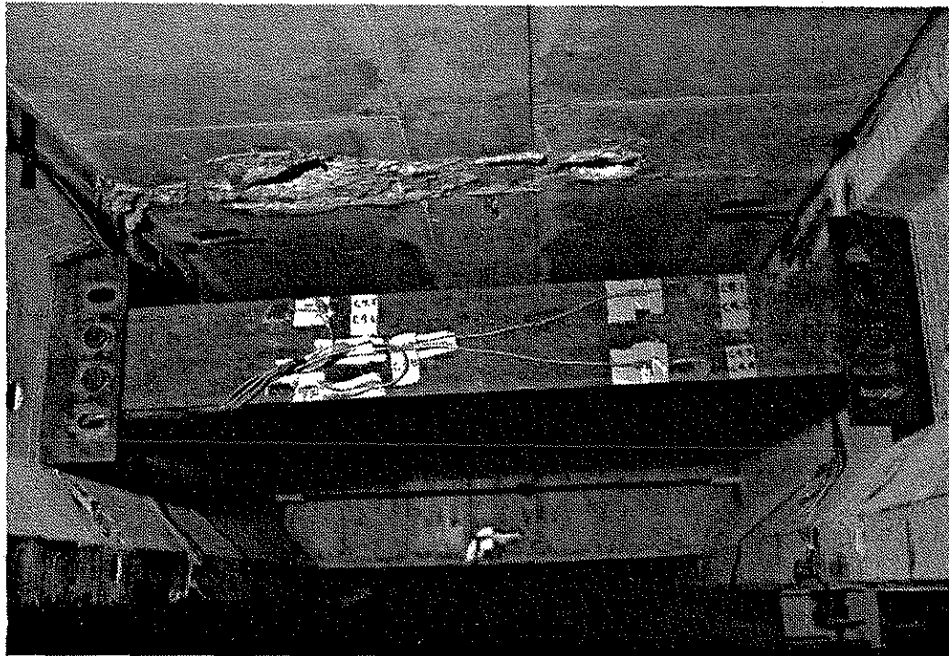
(details in Fig. 2.7a and photograph in Fig. 2.7b) shows the steel strut and cross-brace assembly that was developed and modeled after the diaphragms used by some state agencies. This diaphragm provided lateral support to the P/C girder along essentially the entire depth of the girder at the diaphragm location. A wood template was used for a pattern in the fabrication of the actual structural steel diaphragm. The 3/4-in.-thick gusset plate was cut to match the general cross-sectional profile of the girder along one side. Along four of the five fitted edges of the gusset plate, 3/4-in.-thick by 6-in.-wide plates were welded at right angles to the gusset plate. These edge plates were used to fasten the gusset plate to the P/C girders. Holes were drilled in the 3/4-in.-thick edge plates to match the coil inserts that had been installed in the flanges of the P/C girders and to match the holes cast in the girder webs. Bolts were used to secure the steel brackets to the girders.
